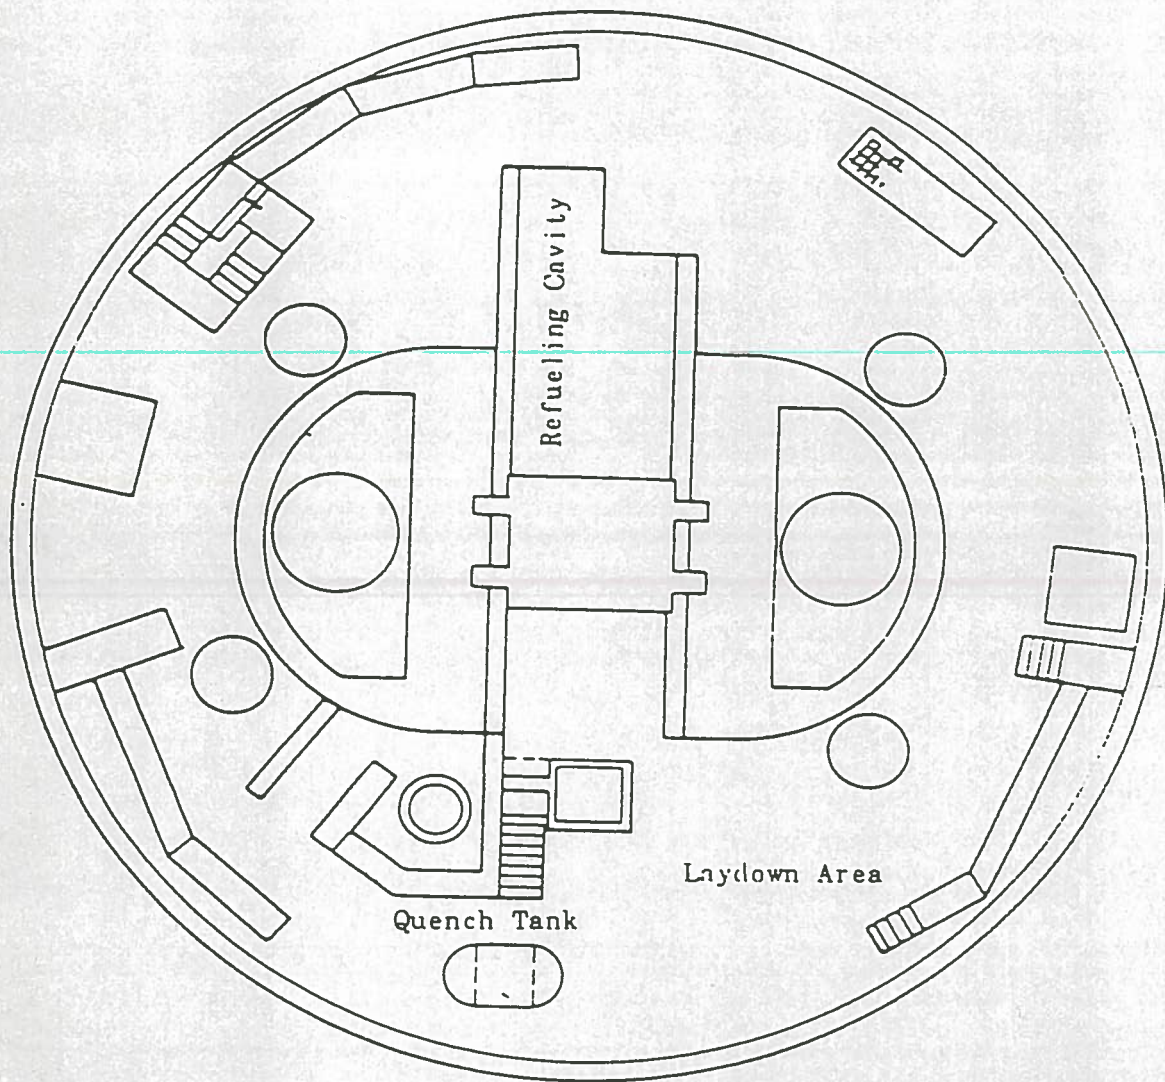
Physical Layout of the D-rings Inside the Containment Structure at the +46 ft. Elevation
